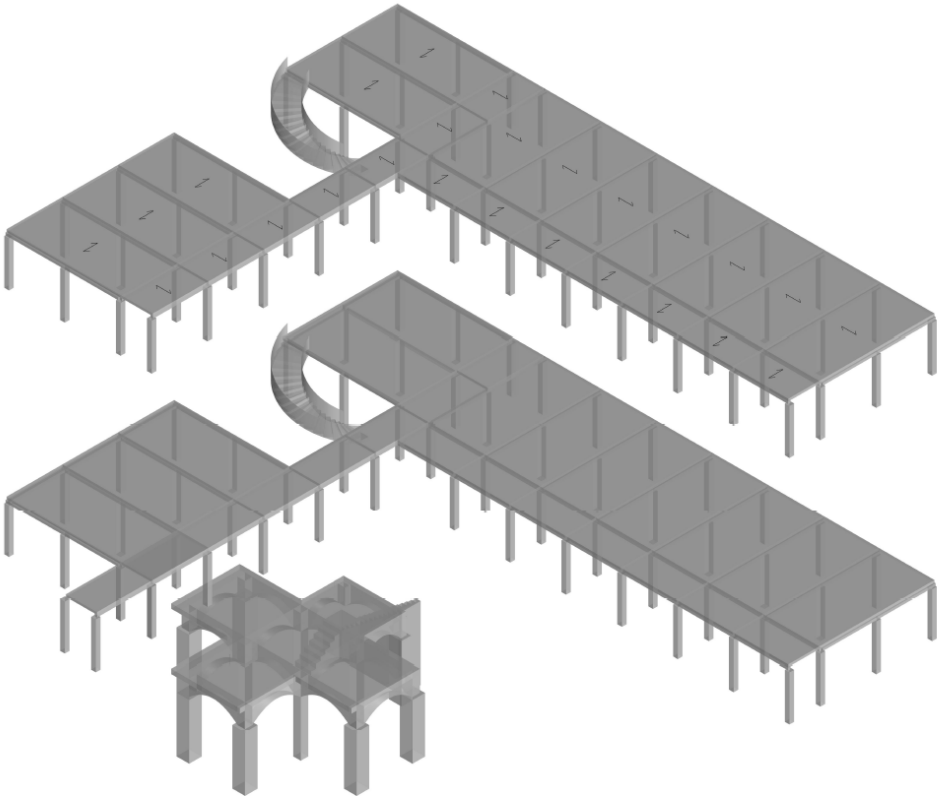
Construction diagram of the new mass: ground floor, first floor and a small basement, matching the existing building in height and rhythm (Source: by author).
